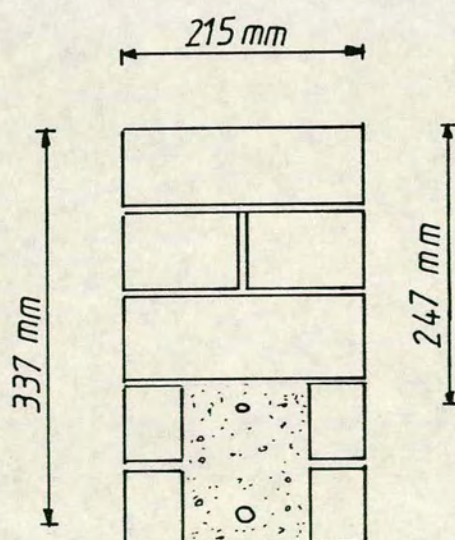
Beam Section of WALKER⁽¹²⁾
